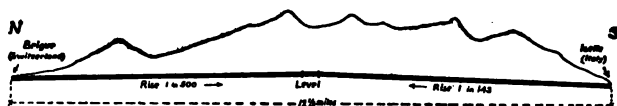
Section of the Simplon Tunnel. The tunnel rises towards the centre to give drainage by gravitation.
